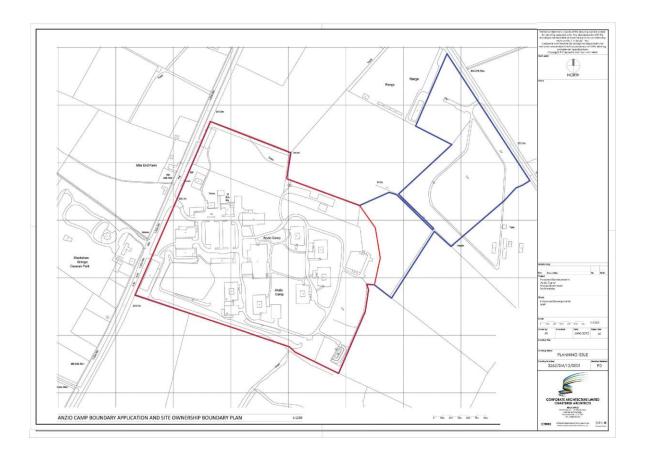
Site Location Plan (drawing no. 3262/SM/12/00001).
